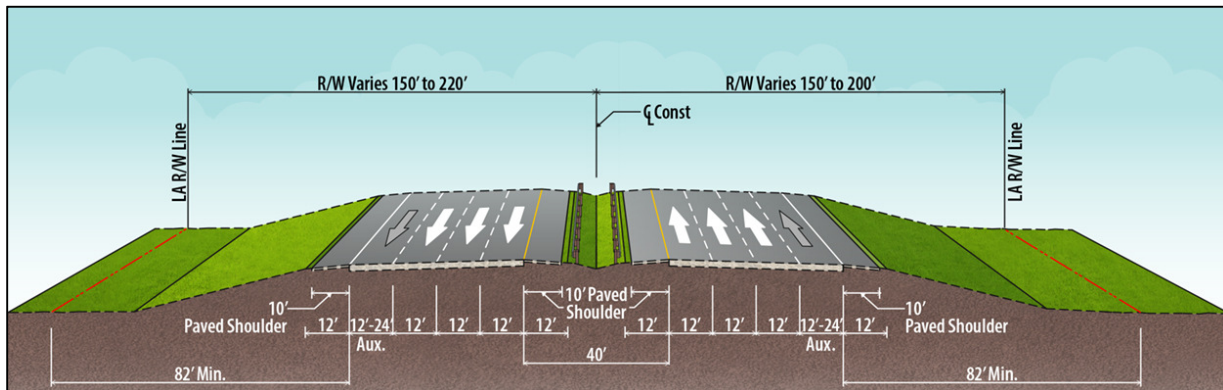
Existing I-275 Mainline Typical Section from Roosevelt Boulevard to south of 9th Street North (Segment C-2)
